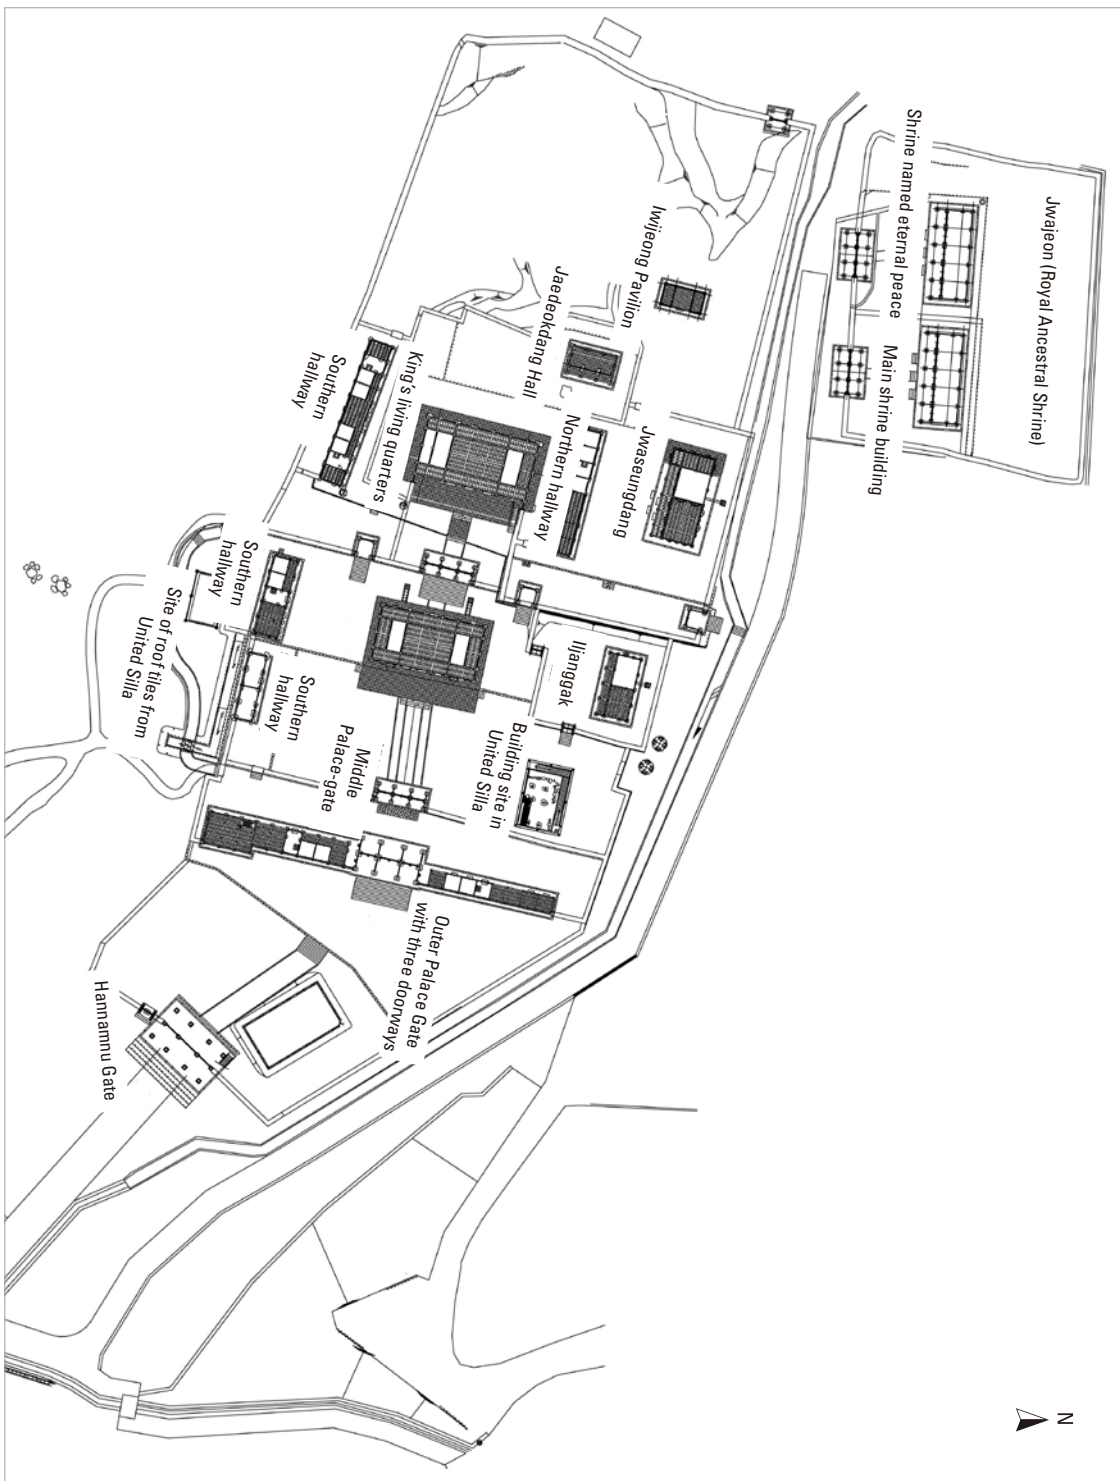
Site Plan of Reconstructed Namhansanseong Emergency Palace
